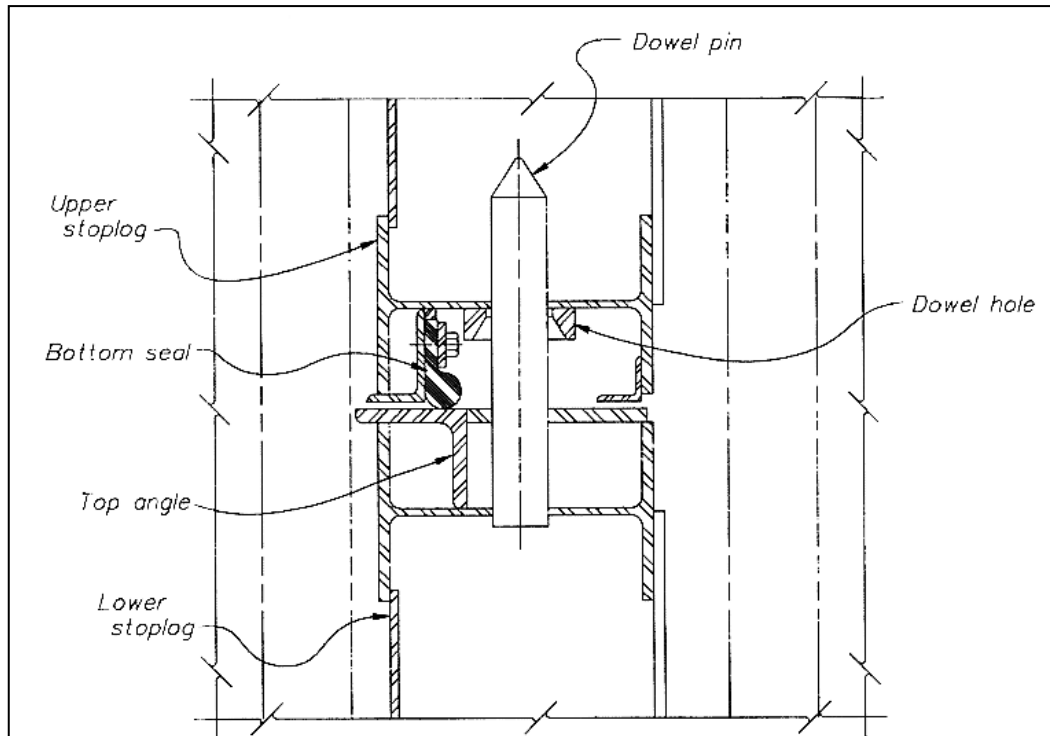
Section through stacked stoplogs at installation.
